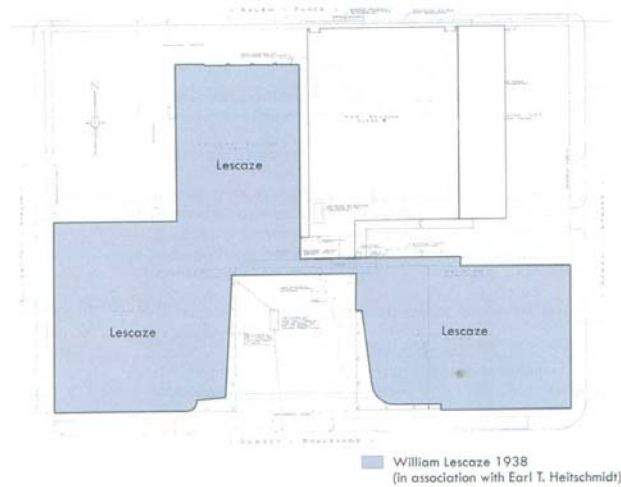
Site Plan highlighting 1938 Lescaze-designed components
